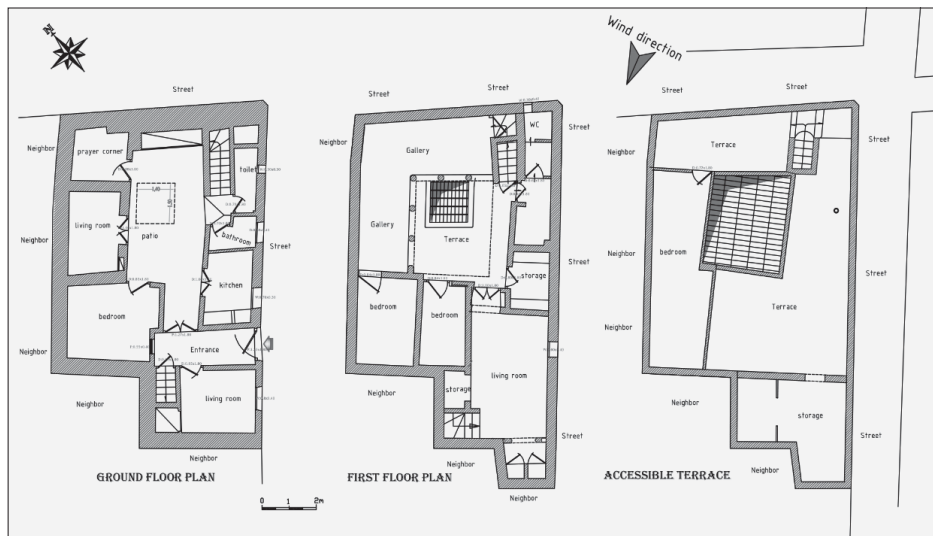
ARCHITECTURAL PLANS (DWELLING KSAR BENI ISGUEN)
